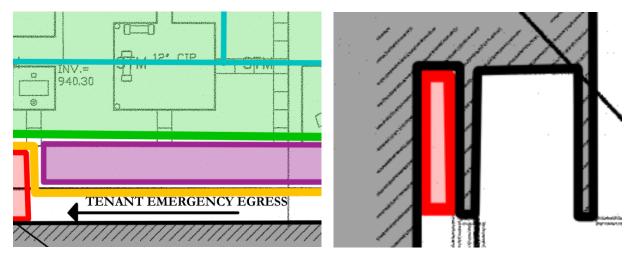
Cropped Views of the Site Logistics Plan Showing Tenant Emergency Egress and Covered Walkways
